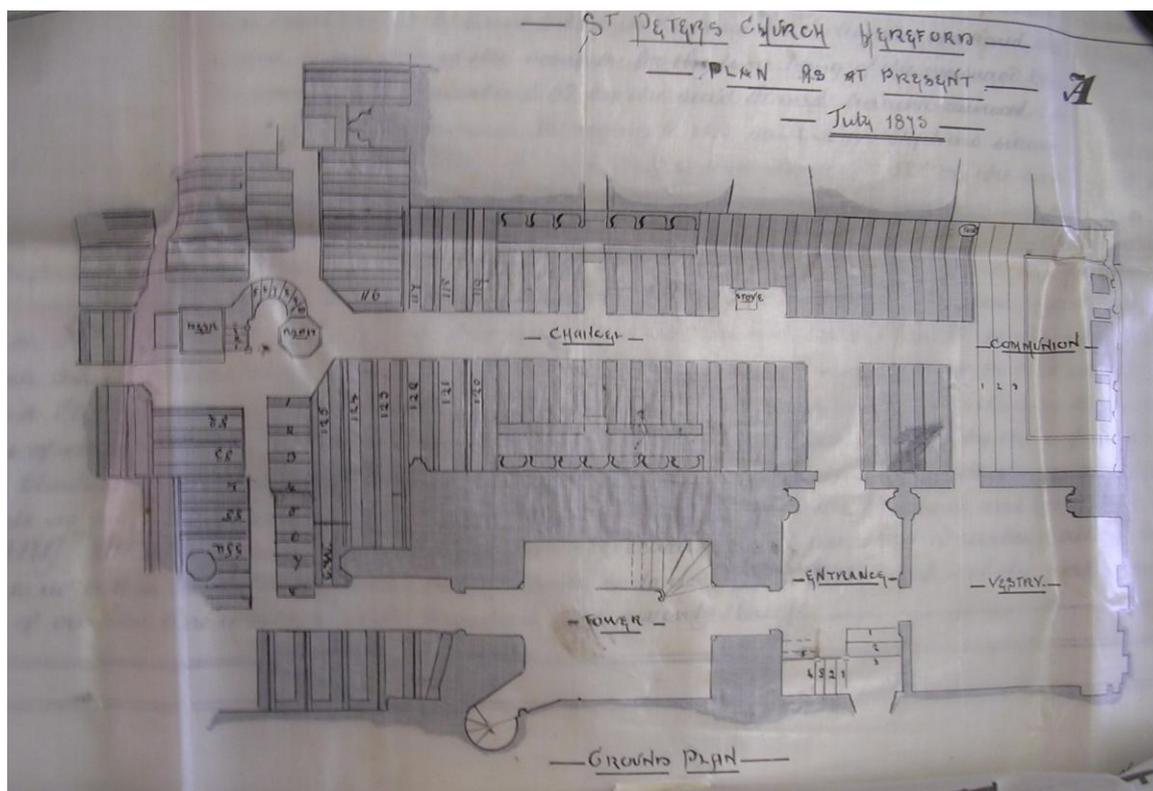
Plan of Chancel of St Peter's Church prior to the restoration carried out in 1873
